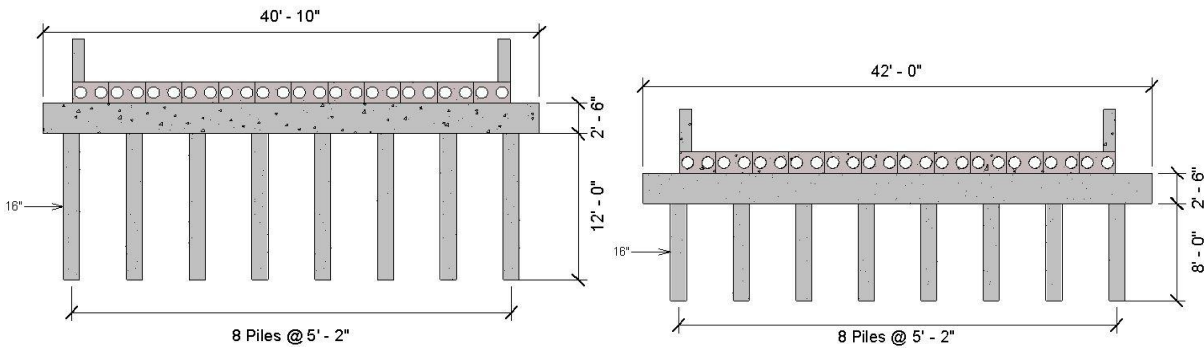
Cross section view of typical: (Left) intermediate bent; (Right) end bent.
